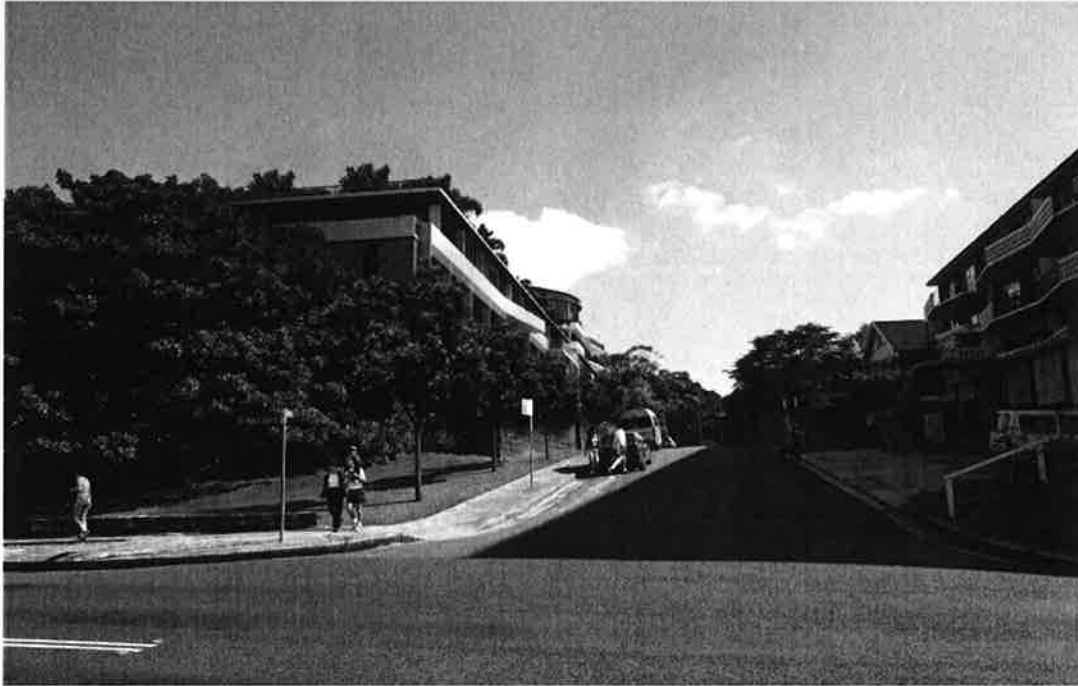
Artist impression of the proposed development to St Pauls Street.
